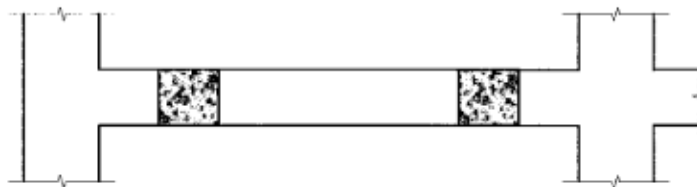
Detail of developed hybrid precast concrete beam system (Yang *et al.*, 2010)
